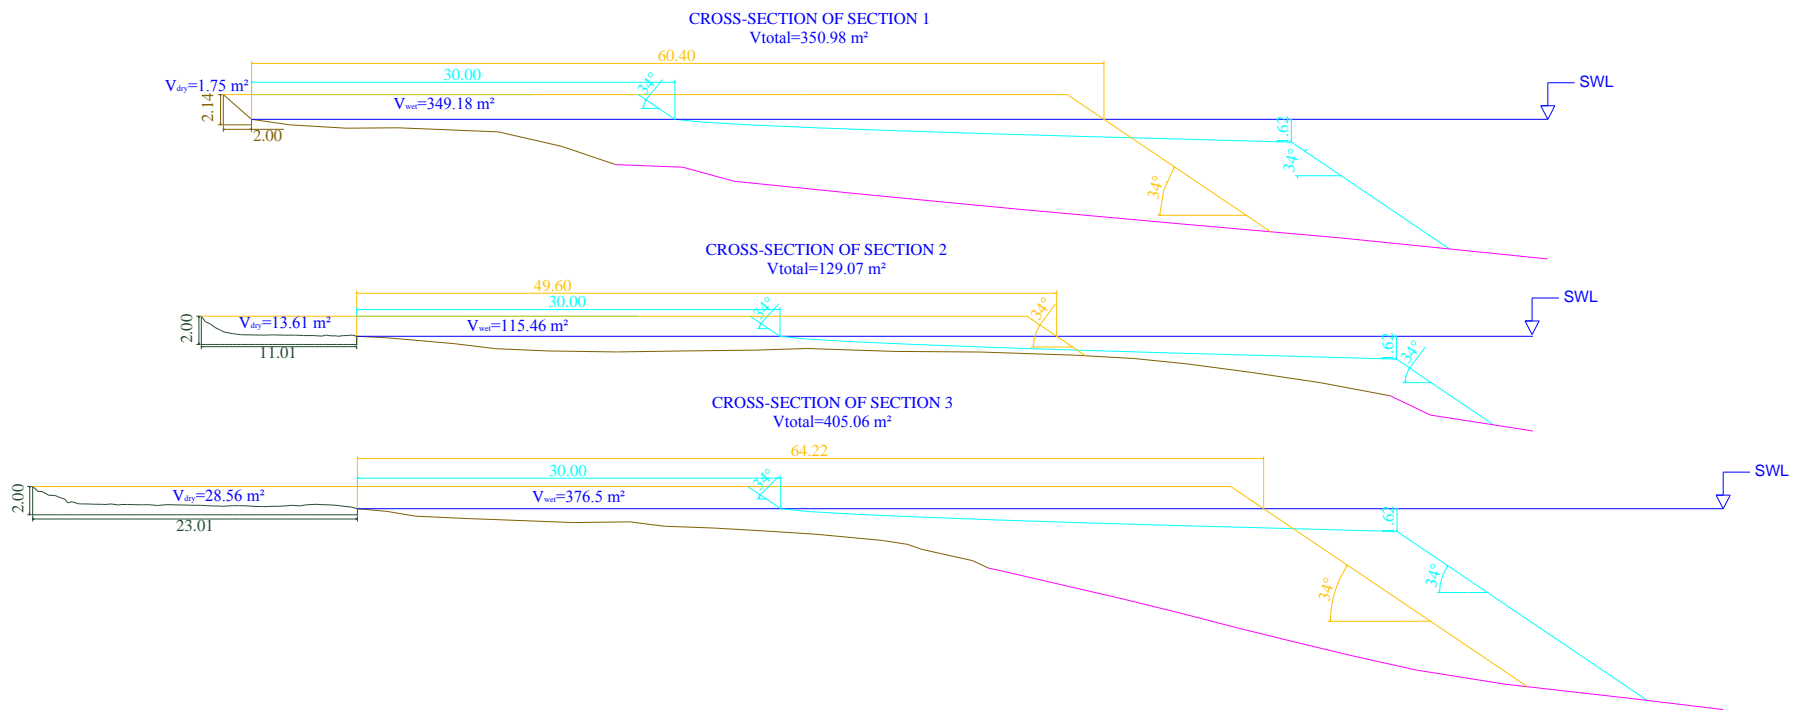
Design profiles of Section 1,2 and 3 for 30 m new dry beach width ($D_{fill}=0.32$ mm).
